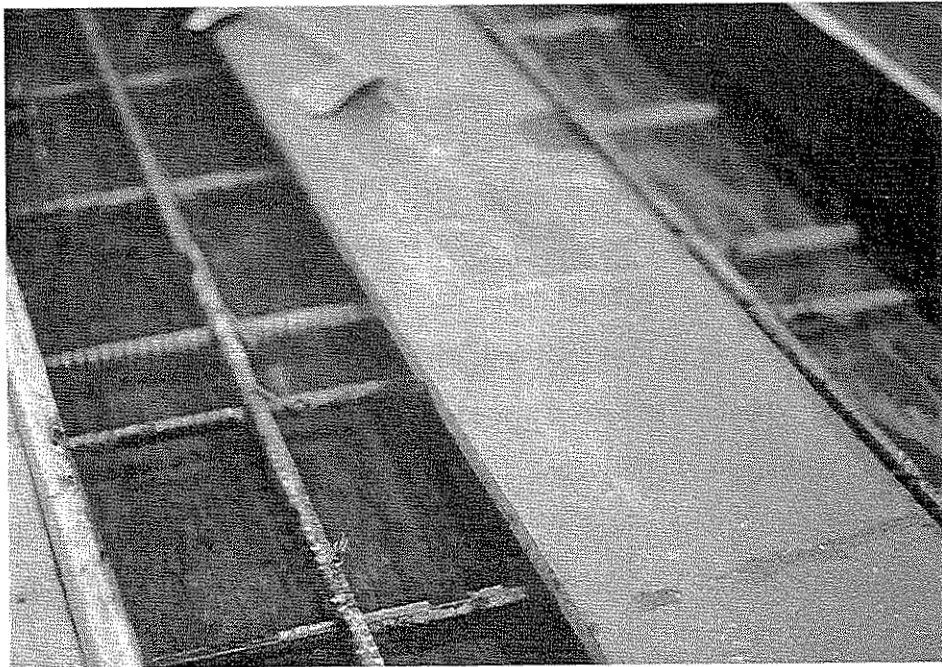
Composite beam specimen: Imbedded I-beam (Specimens 2 and 3).
